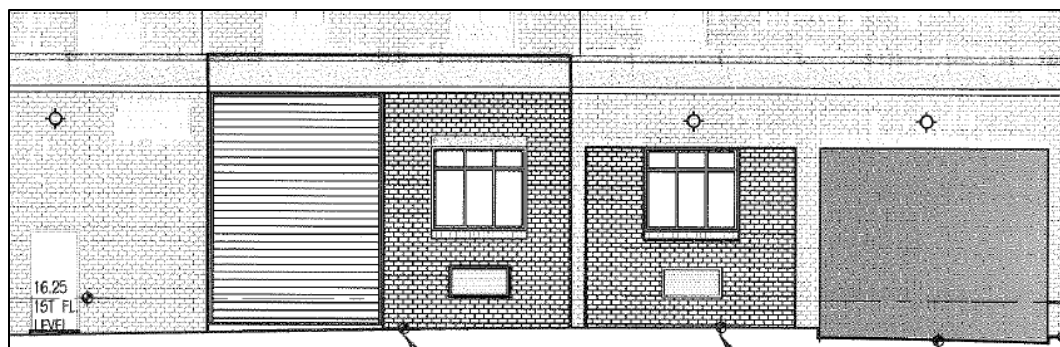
Dechantal Street Elevation View: Service door, loading bay, two new hotel room windows, existing parking entrance
